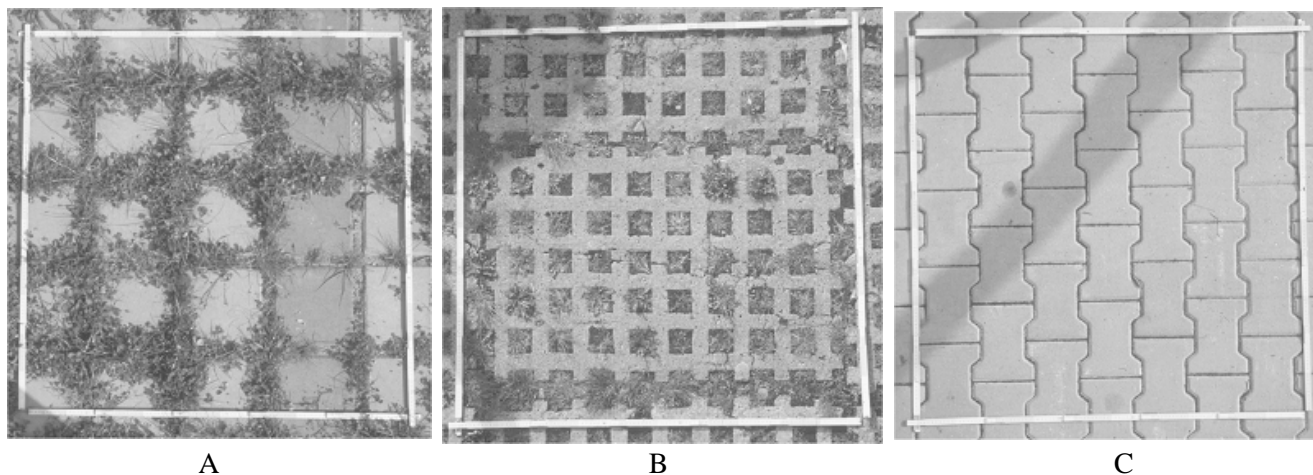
Examples for different types of surface cover: (a) bricks with grassed openings, (b) concrete plate with drainage openings, (c) brick pavement
